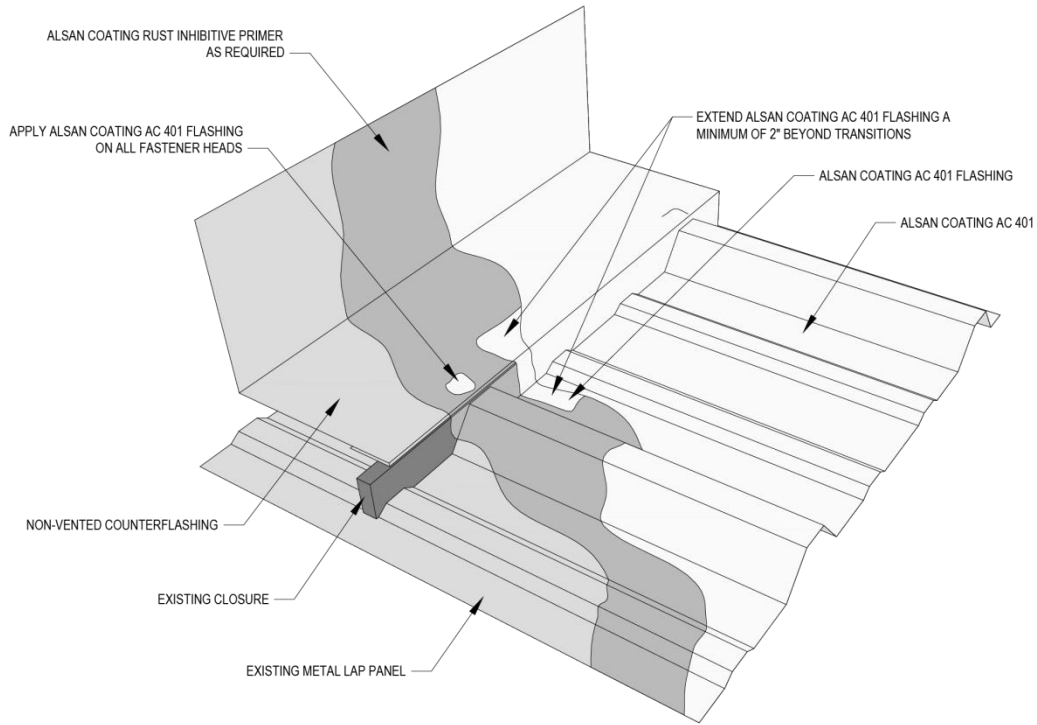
Acrylic Roof Coating Over Metal Lap Panels, Wall/Curb
